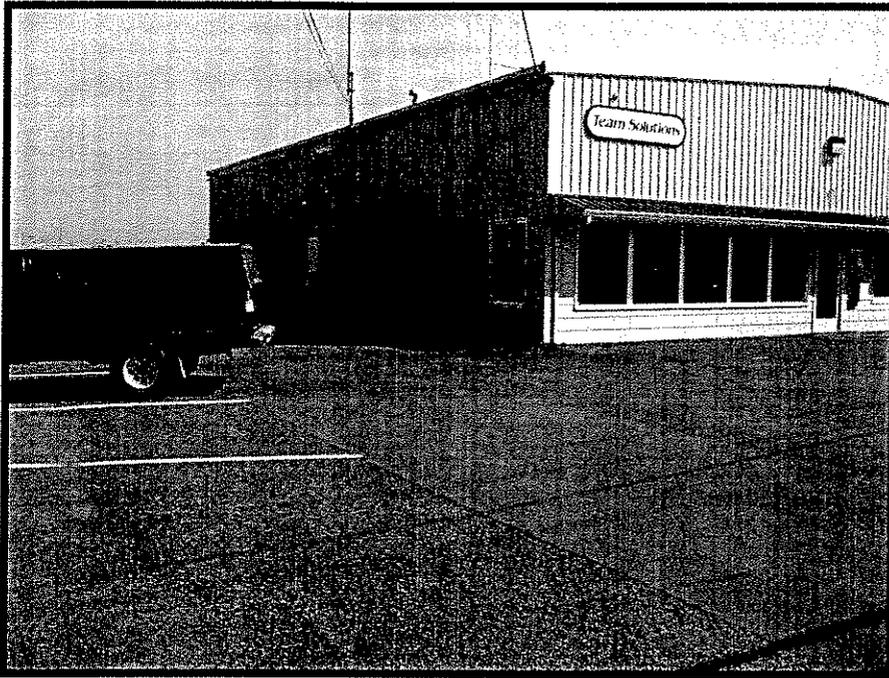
Photo 1 shows the existing on-site, building parking lot, and some of the parking spaces. Photo taken by SHN on 4-3-07; orientation is northeast.
